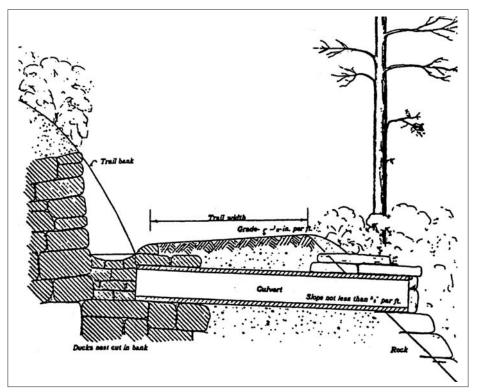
Civilian Conservation Corps specification for a closed culvert from Guy Arthur, *Construction of Trails*, 1937.
